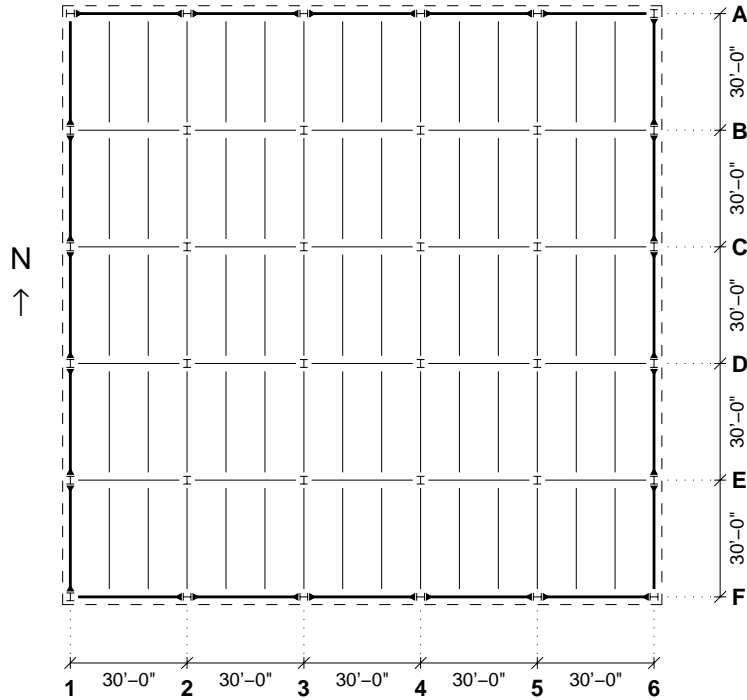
Typical floor plan of the SAC 9-story building (excerpted from Luco, 2002)
